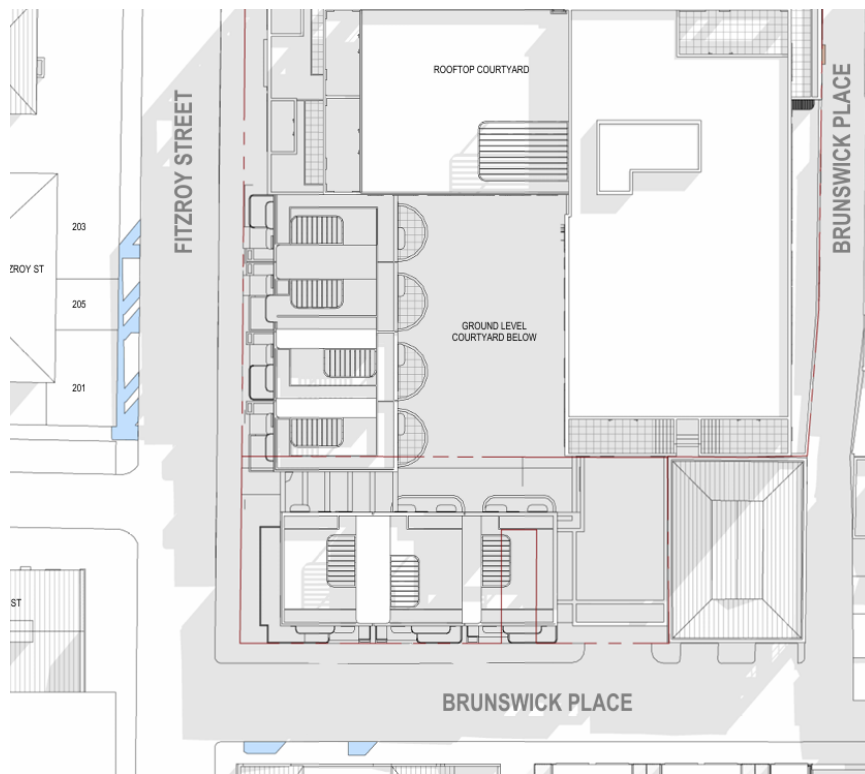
Fitzroy Street shadow at 10.15am – Source: Application
